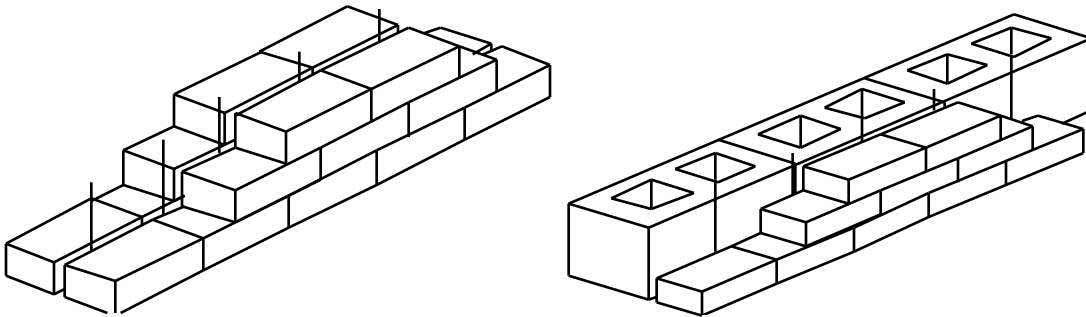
(left) & Fig 19 (right): Structural Masonry Wall Construction
